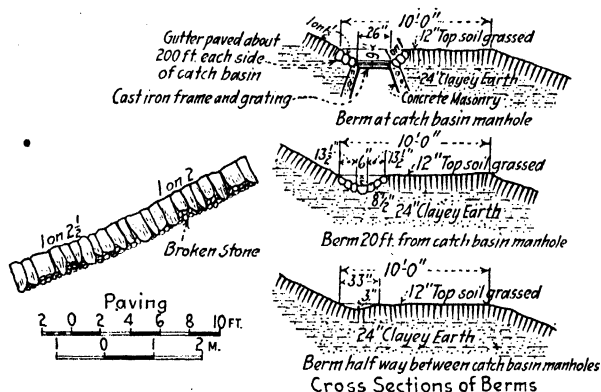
Ashokan dikes. Paving and berm dimensions.
